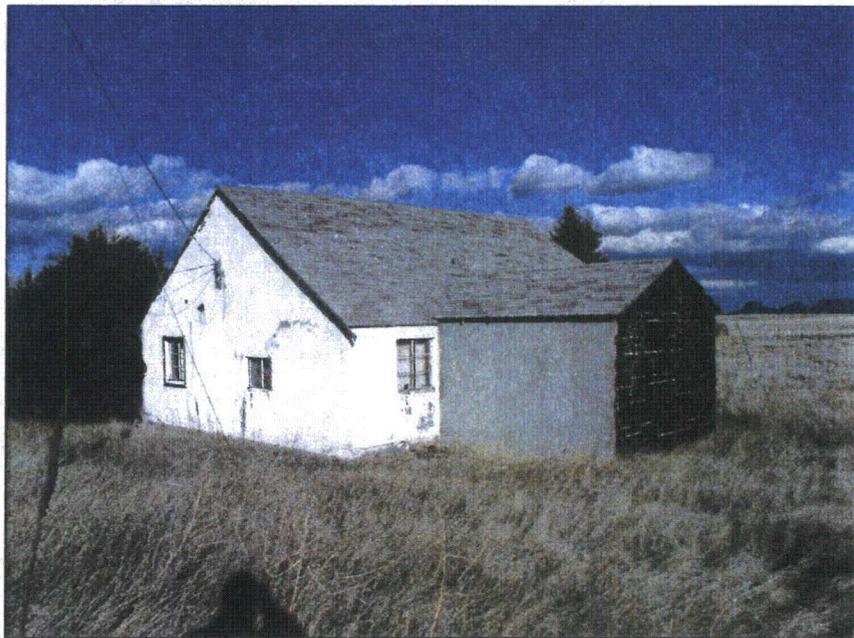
25DW308. Southwest elevation of S1. Sam Cason 1-12-06.
